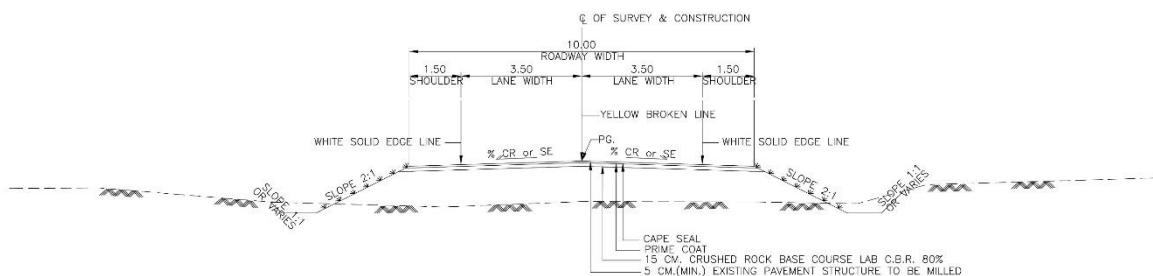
Alt.2 Cape Seal Surface : Both Carriageway and Shoulder
